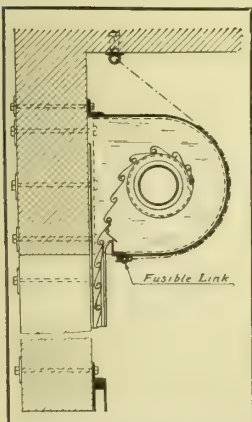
ELEVATOR AND STAIRCASE OPENING FIRE-DOORS
